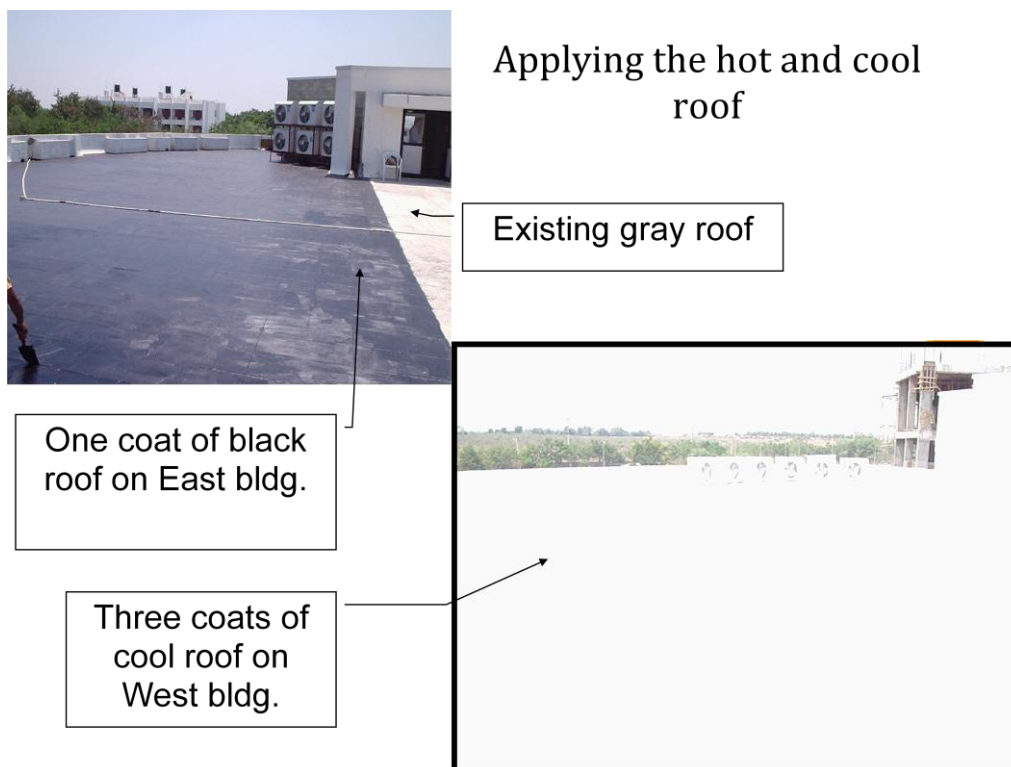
East building roof coated in black and the west building roof coating in white during the experiment
